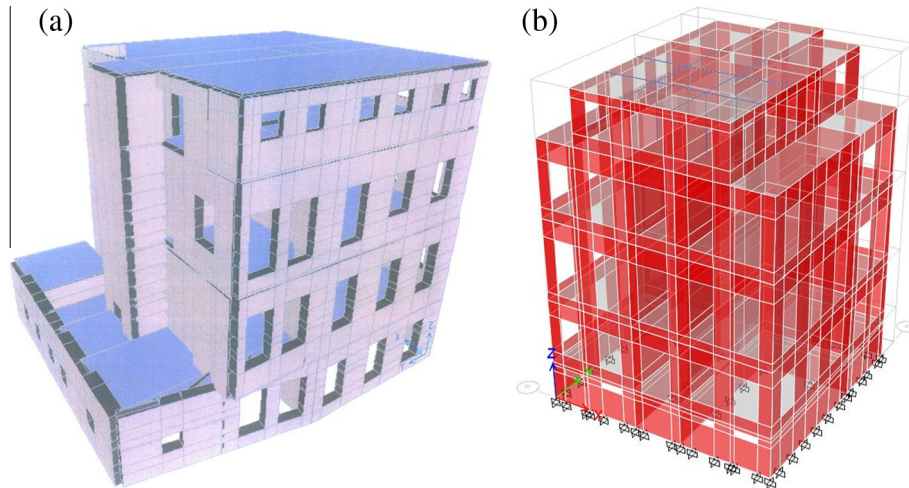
Finite element model of the examined structure: (a) 3D view of the building in pre-restoration, (b) Finite element model of the building.
